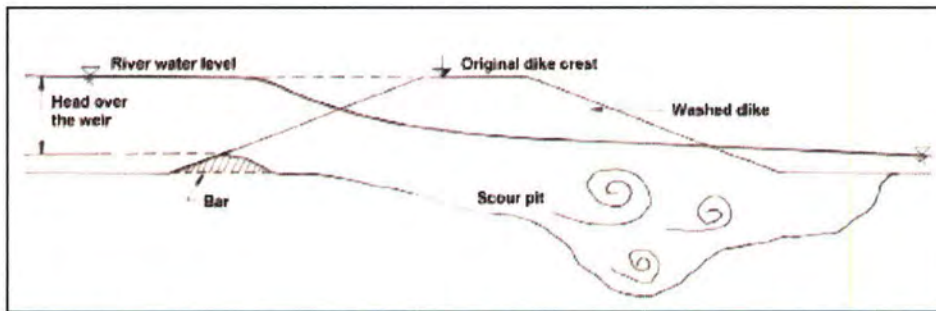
Typical cross section of a levee failure with scour hole (pit) (after Nagy, 2006).
